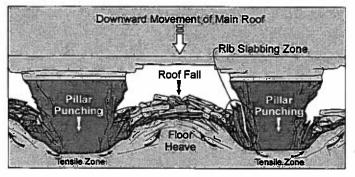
Ultimate Pillar and Roof Failure Resulting from Foundation Failure
